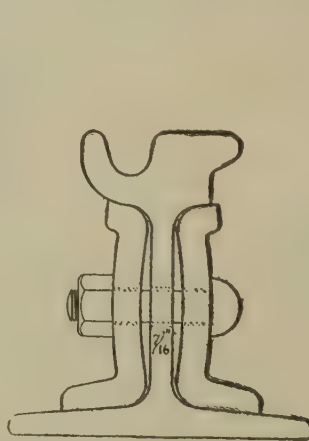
GROOVED GIRDER RAIL—WASHINGTON TYPE.
